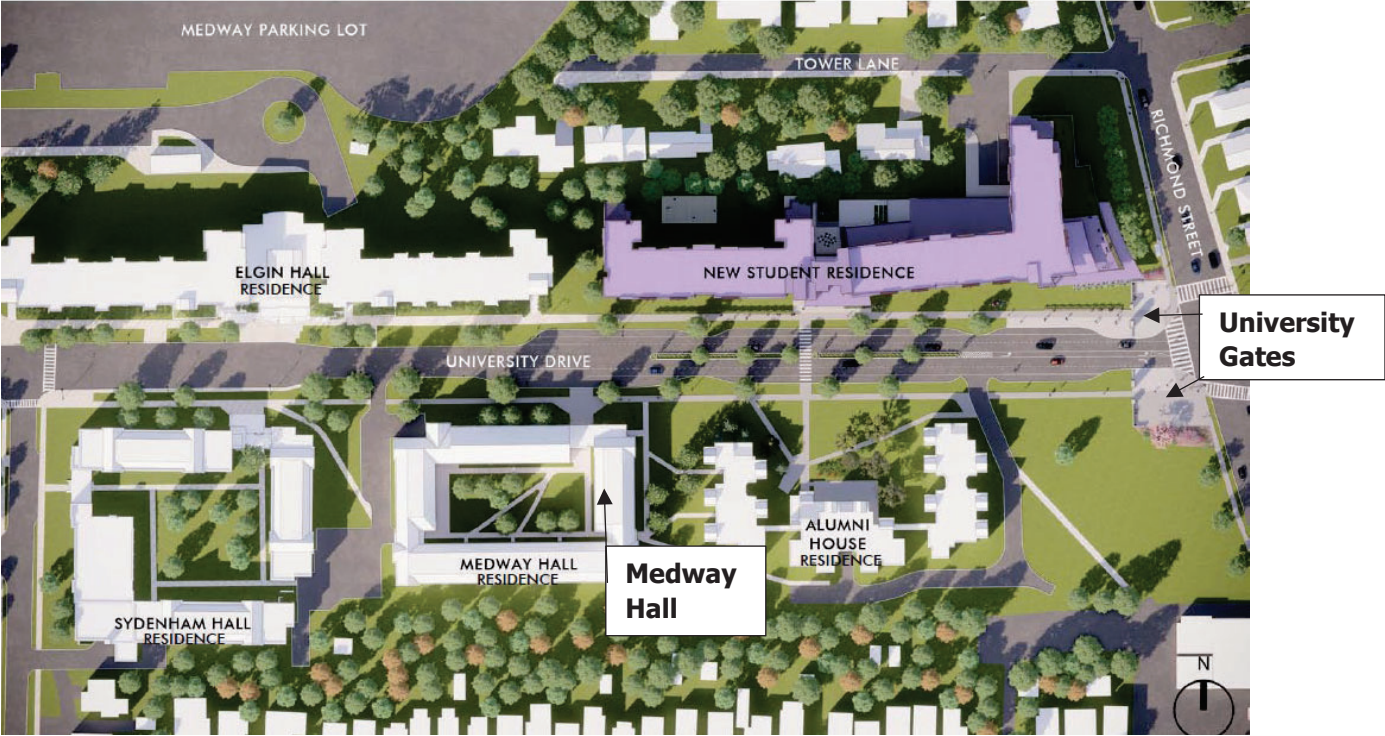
Conceptual plan of proposed student residence and surrounding area (Source: Architects Tillmann Ruth Robinson, 2023).
